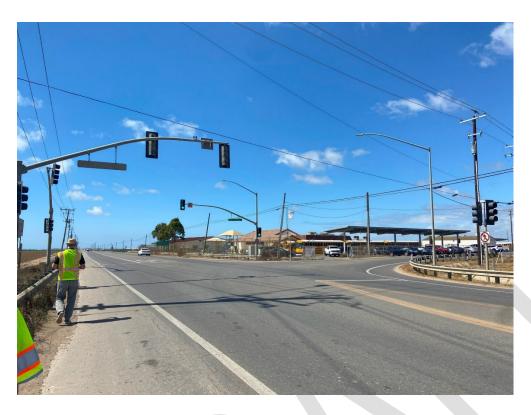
SR 166 AND BONITA SCHOOL ROAD EXISTING CONFIGURATION - SOUTHEAST CORNER
